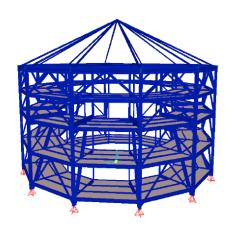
SAP2000 isometric 3-D view of outer pier steel frame and slabs
